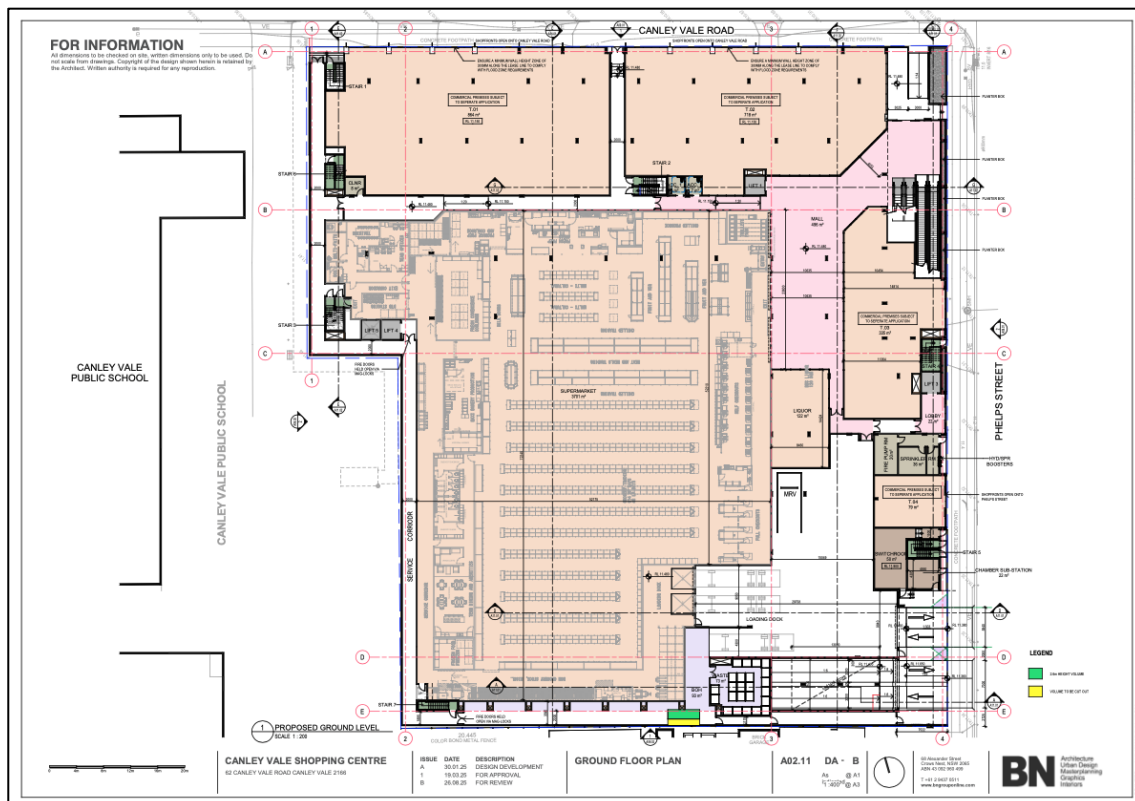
Proposed ground floor plan – supermarket, retail and loading/servicing
